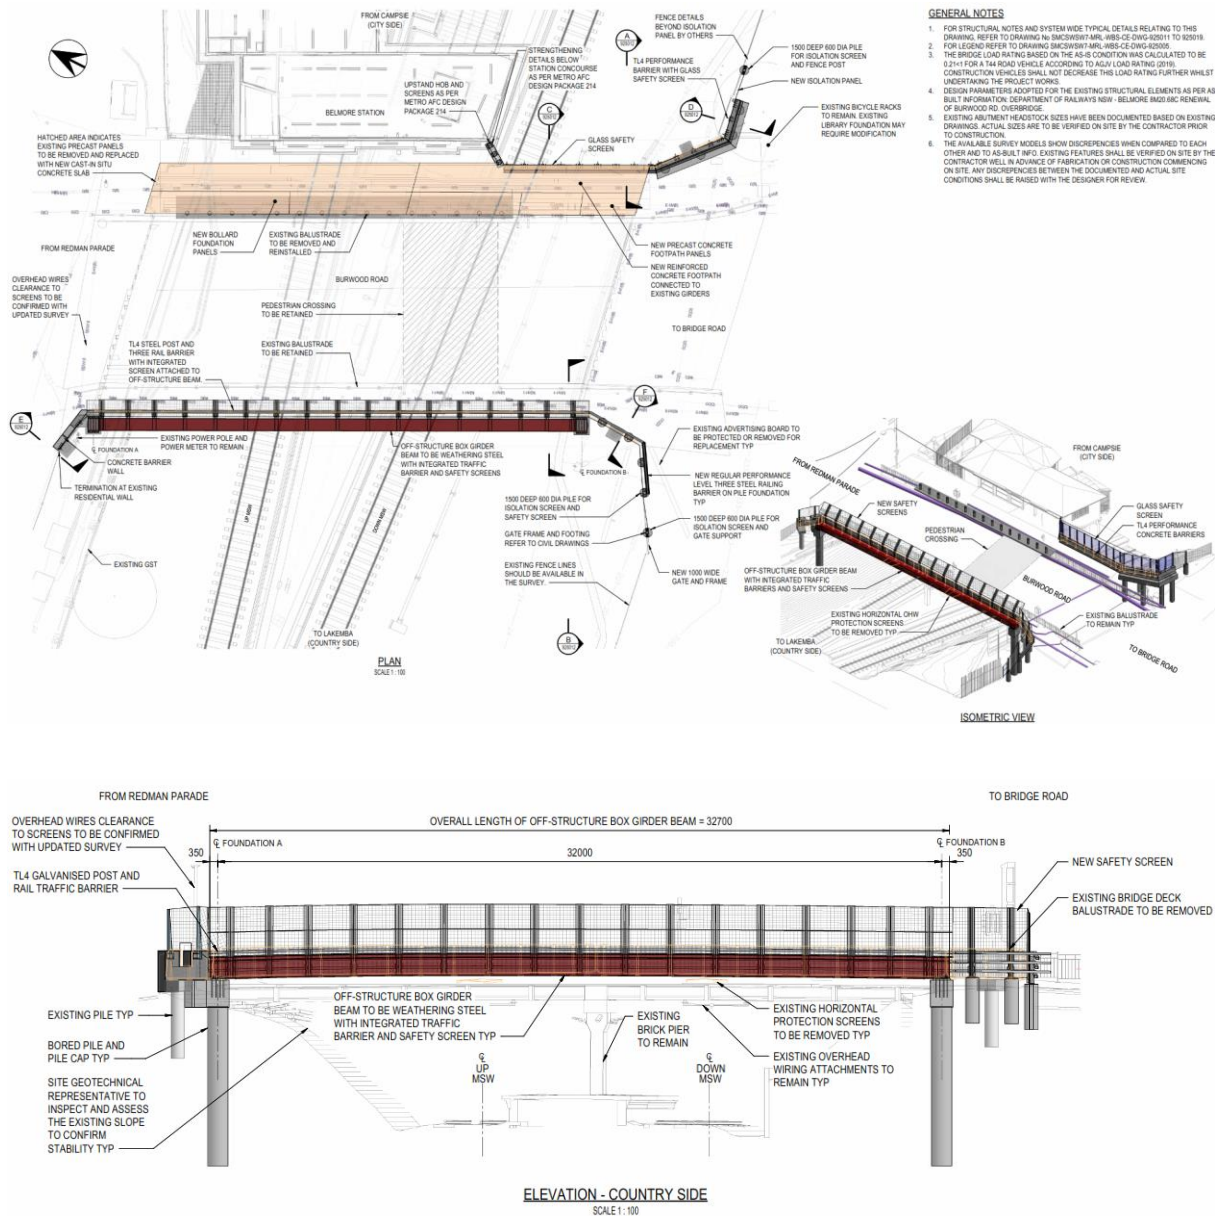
Plans of treatment works for Burwood Road Bridge (Source: Aurecon 2024, provided by ARCH Artifex)
